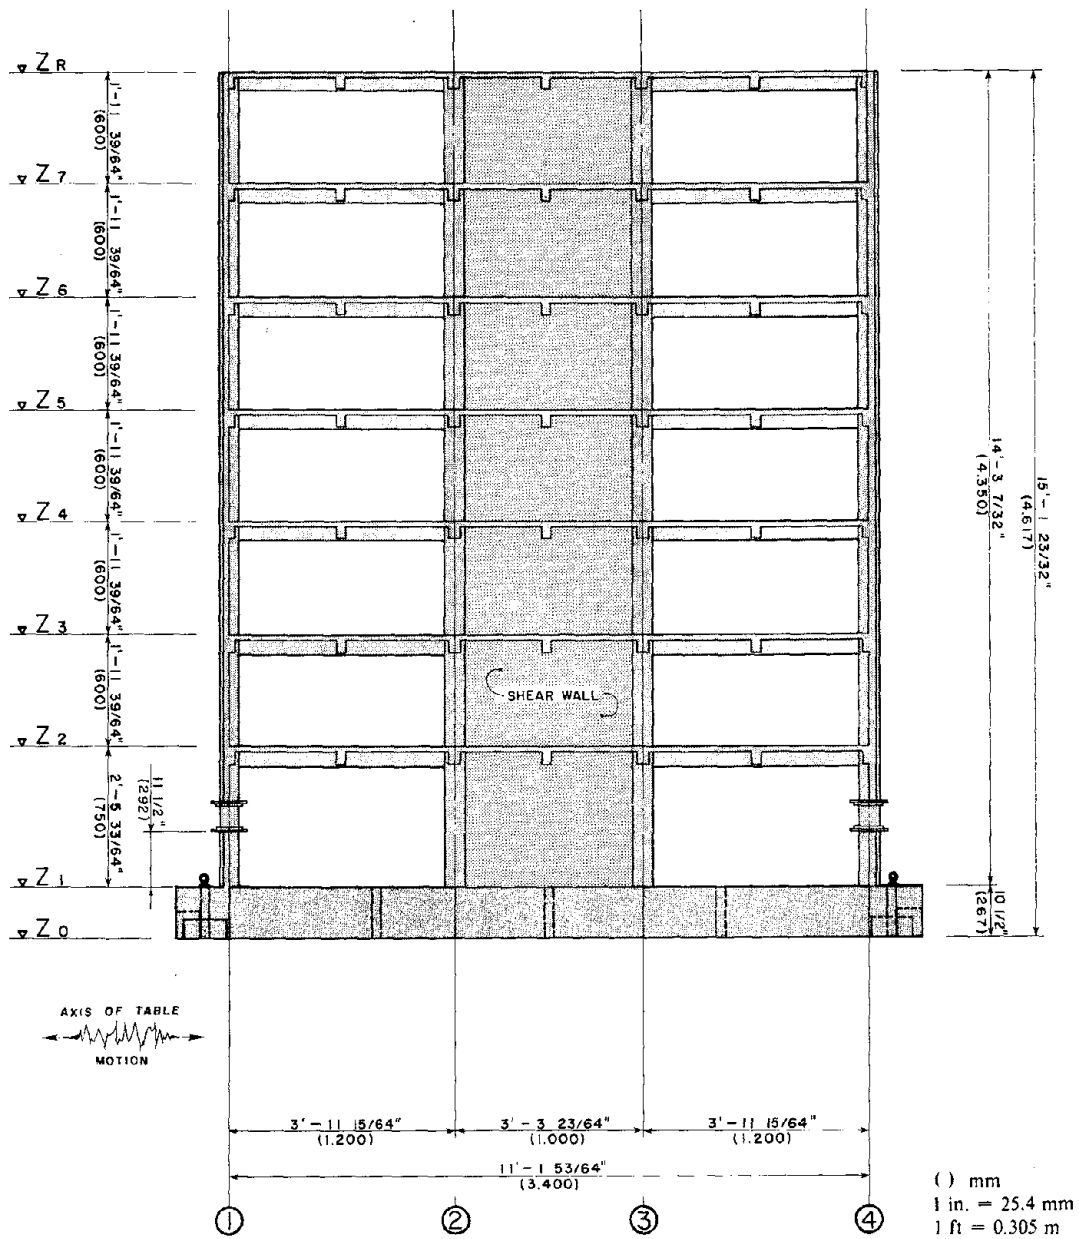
ELEVATION OF THE INTERIOR WALL-FRAME OF 1/5-SCALE MODEL (FRAME B).
